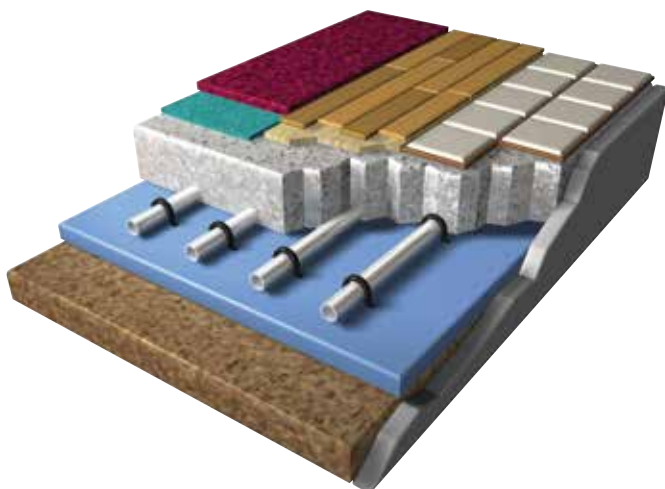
Slab-on or below-grade with underslab and edge insulation
